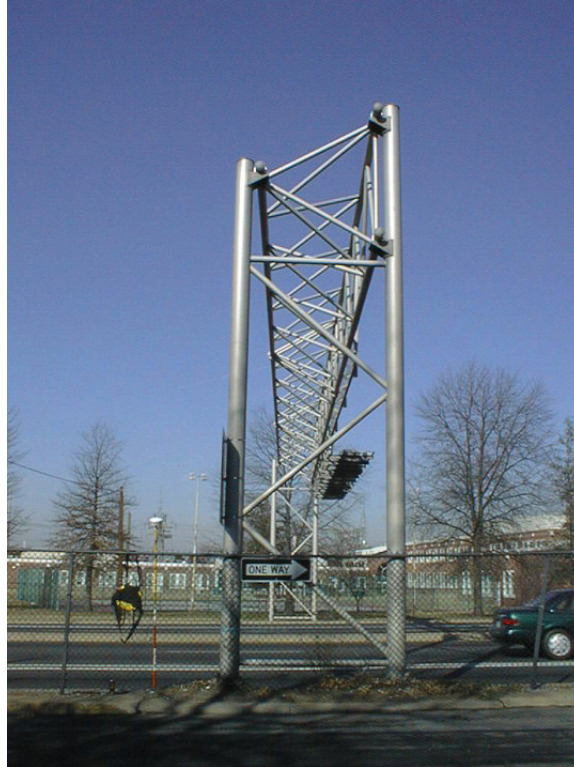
, 9 and 10 show views of tri-chord overhead span sign structures. Figure 4 shows typical details of tri-chord sign structure installed in Virginia.
